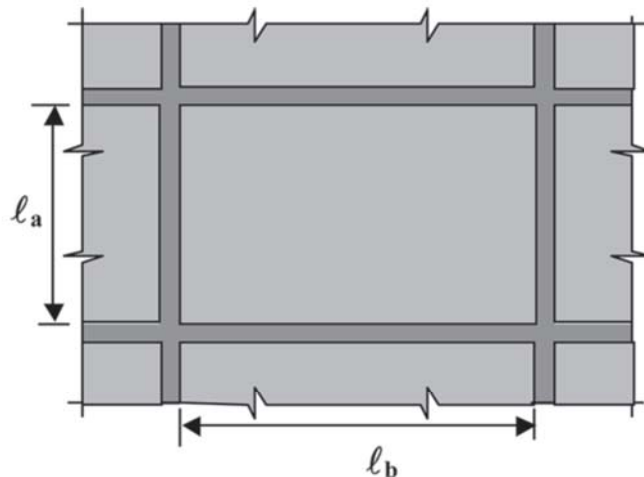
Interior panel of two-way slabs supported on girders, beams, or reinforced concrete walls.
